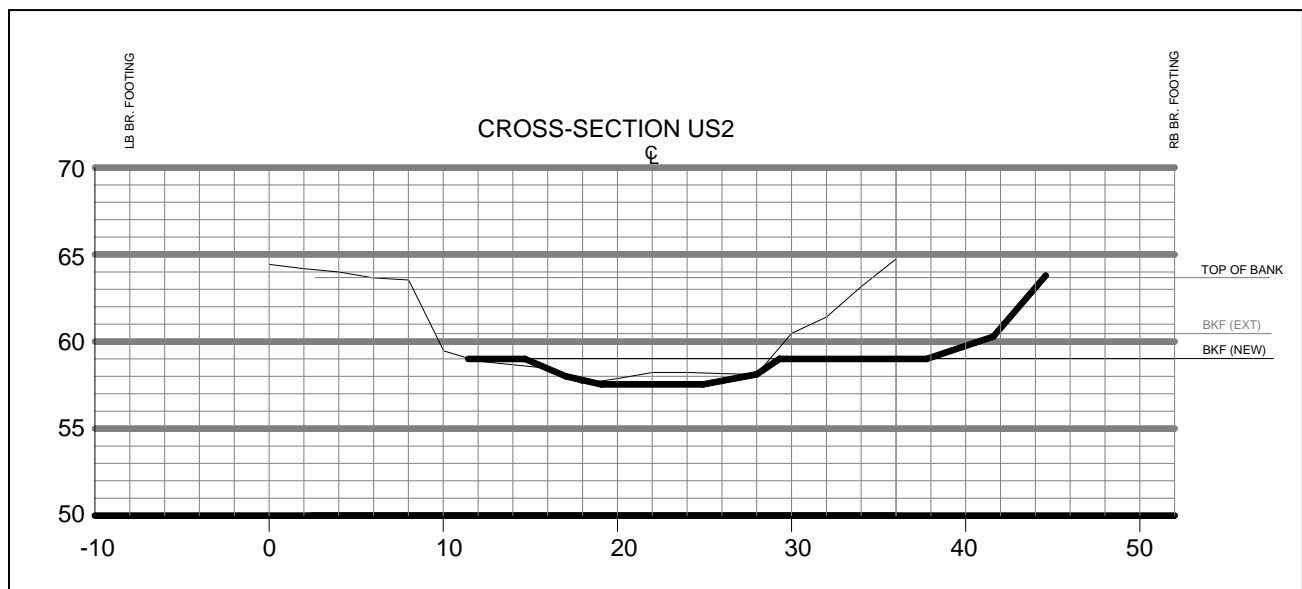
CROSS SECTION 2 UPSTREAM OF BRIDGE (US2) SHOWING BRIDGE CENTERLINE AND FOOTING LOCATIONS. WATER TRAINING AREA IS ON STREAM LEFT.
